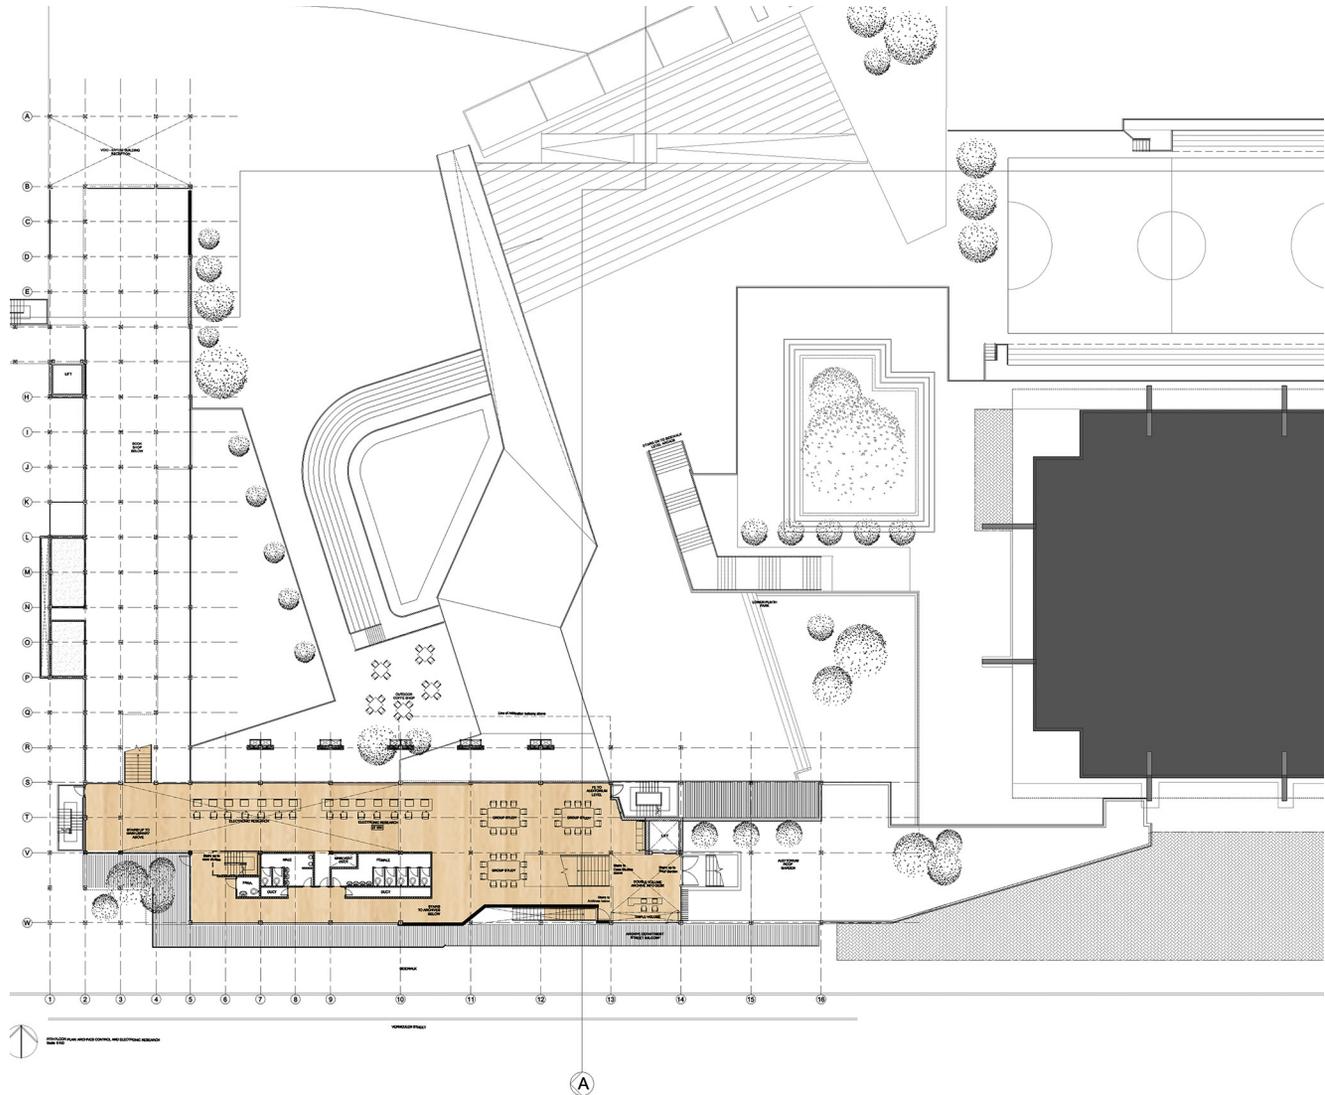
4th Floor Plan: Home Affairs and Public Library (Author 2015)
